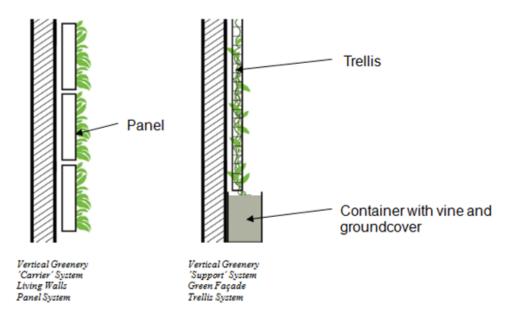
Living Wall and Green Façade Systems definitions (Wong, 2009).
